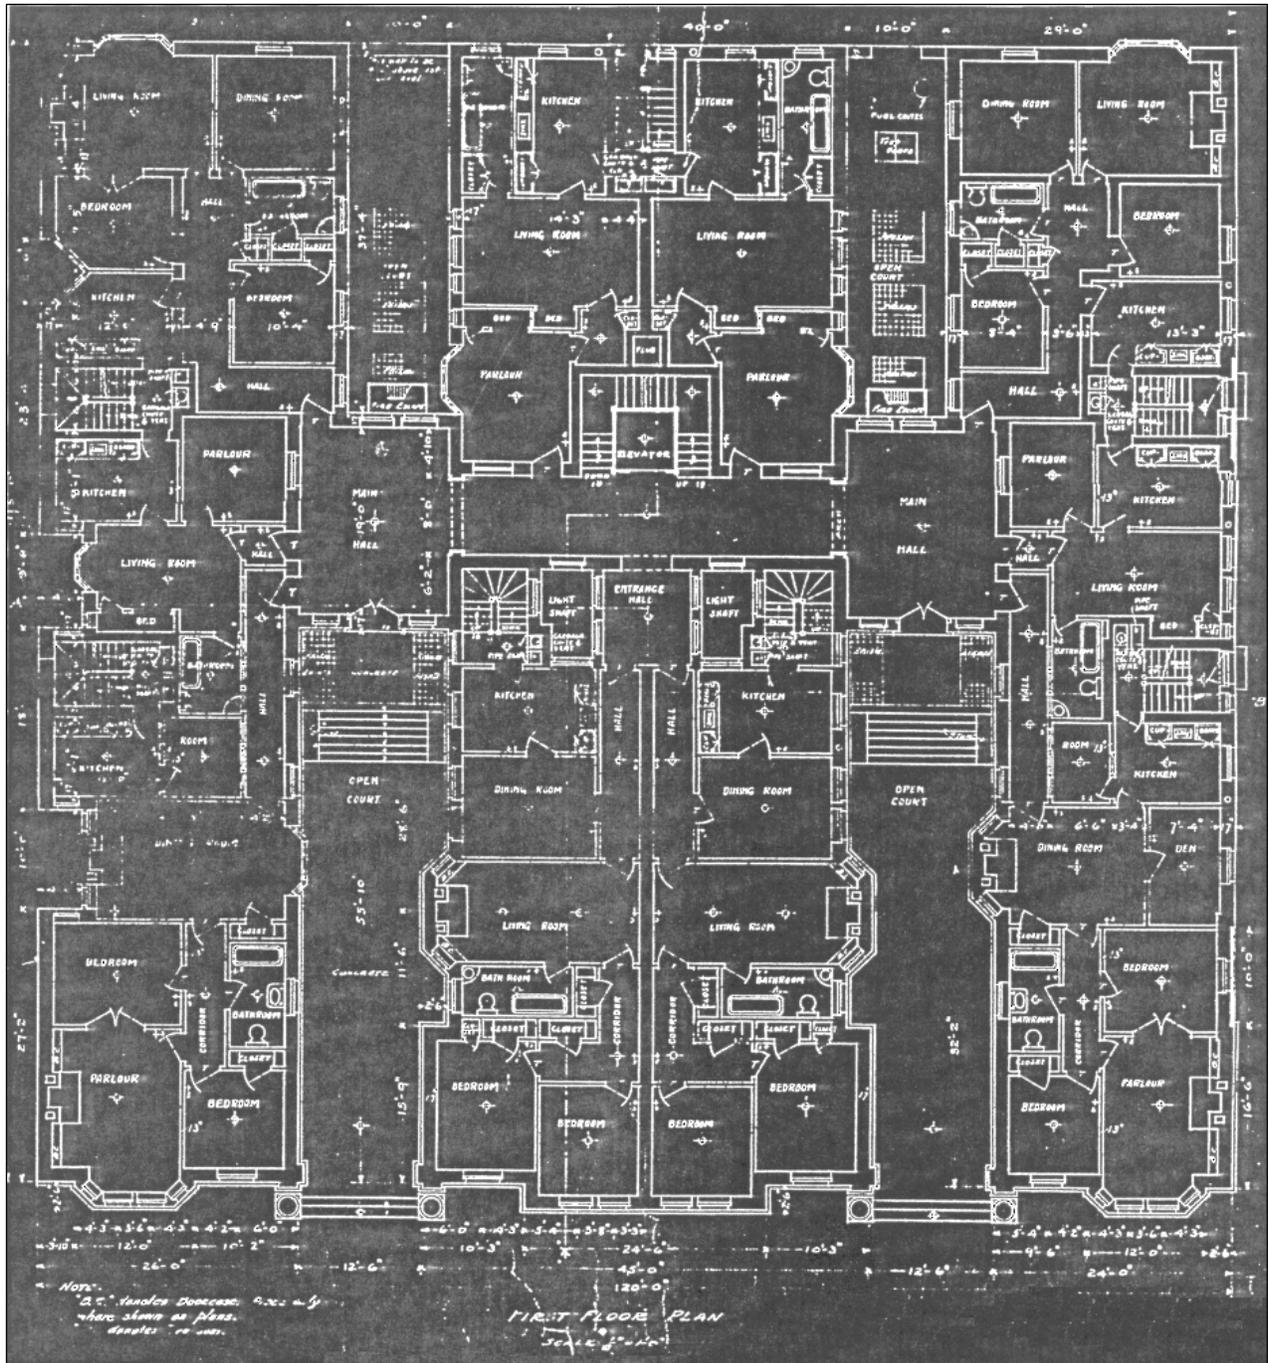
The Princeton Apartments, “First Floor Plan.” (Reproduced from City of Winnipeg, Architect’s Plans, #1045/1909.)
